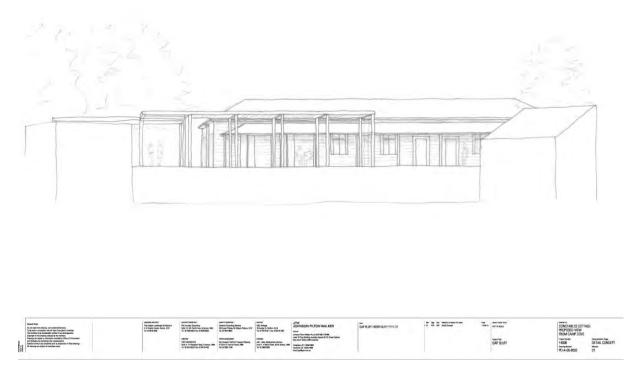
Perspective sketch of the proposed additions and alterations to Constable's Cottage, looking north from Cliff Street. (Source: JPW 2015)
